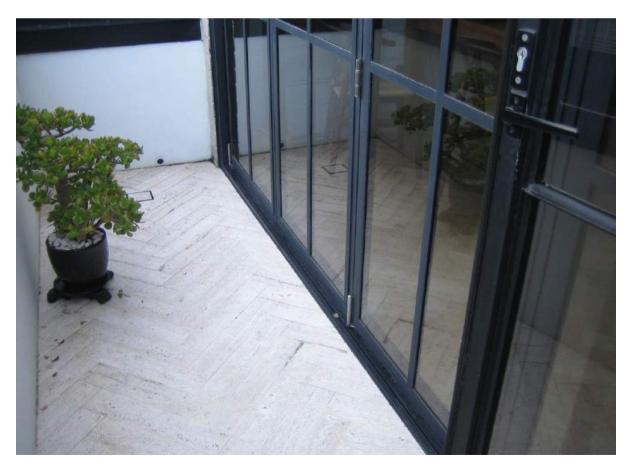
Water penetration and damage at living room balcony doors in Unit 406.
